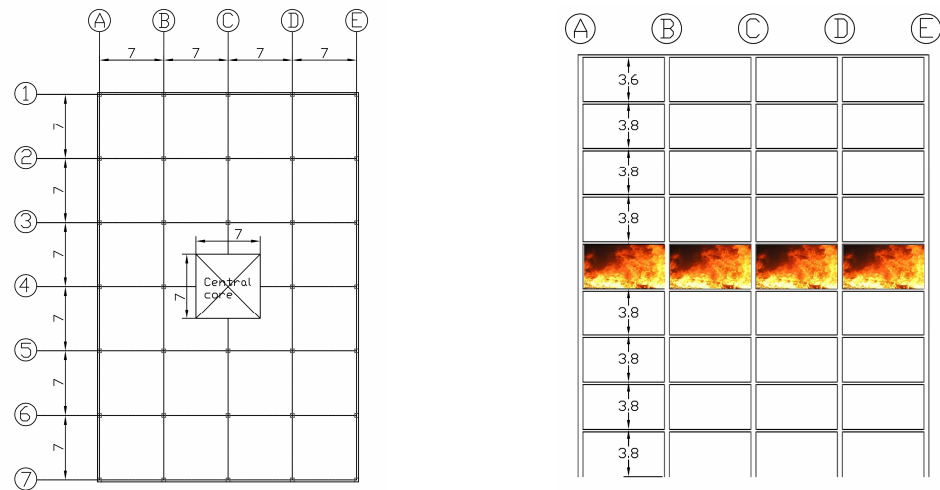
Plan and elevation of concrete structure, dimensions in metres.
